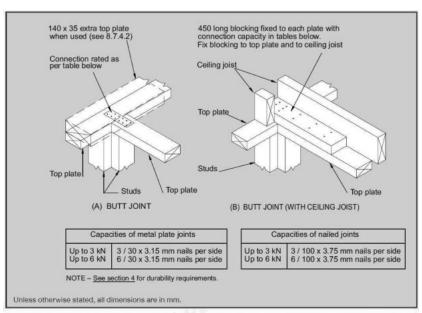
Connecting top plates to external walls at right angles - Walls containing bracing (see 8.7.3.4)
